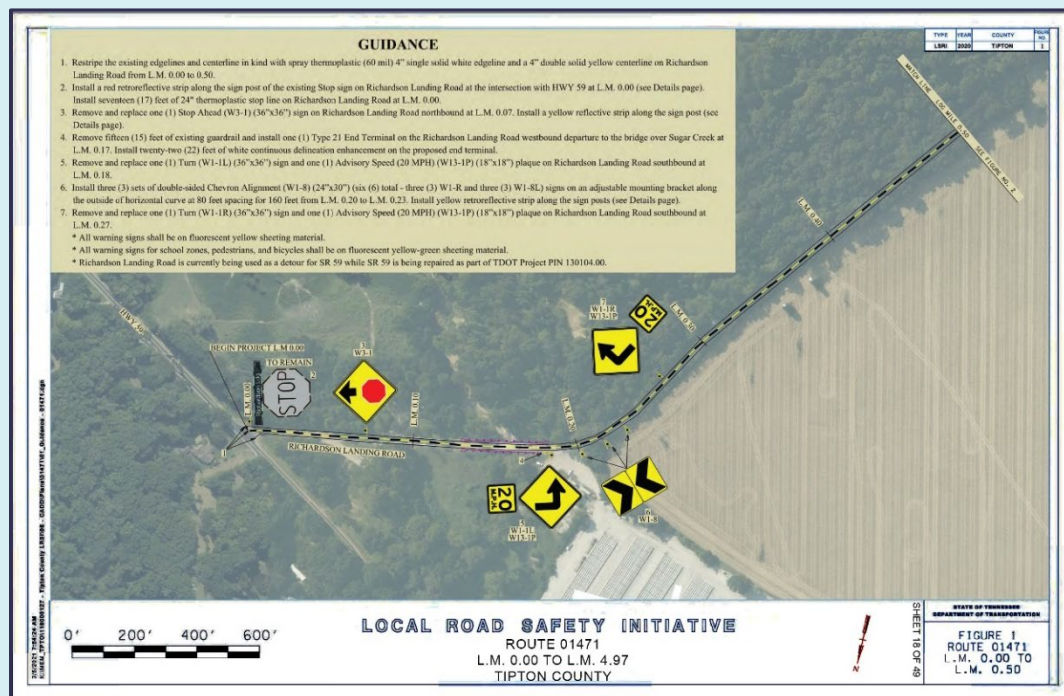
Graphic. Sample No Plan Contract plan from TDOT (Source: TDOT¹¹).
